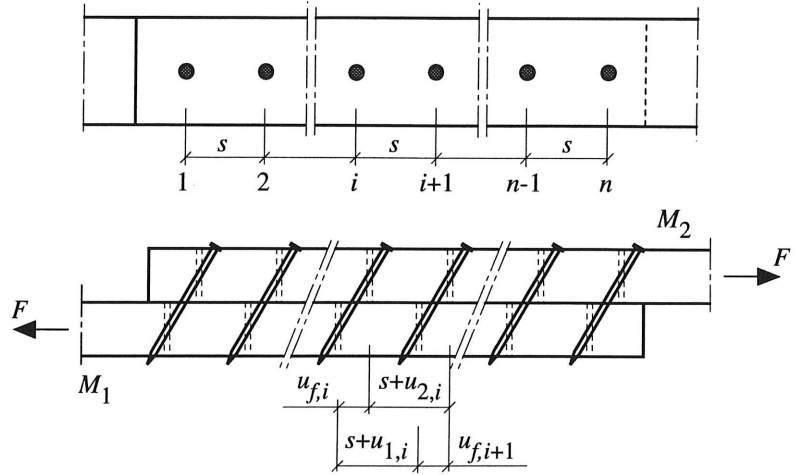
View of undeformed connection (top) and section showing deformed position (bottom) M_1 : Member 1; M_2 : Member 2.
